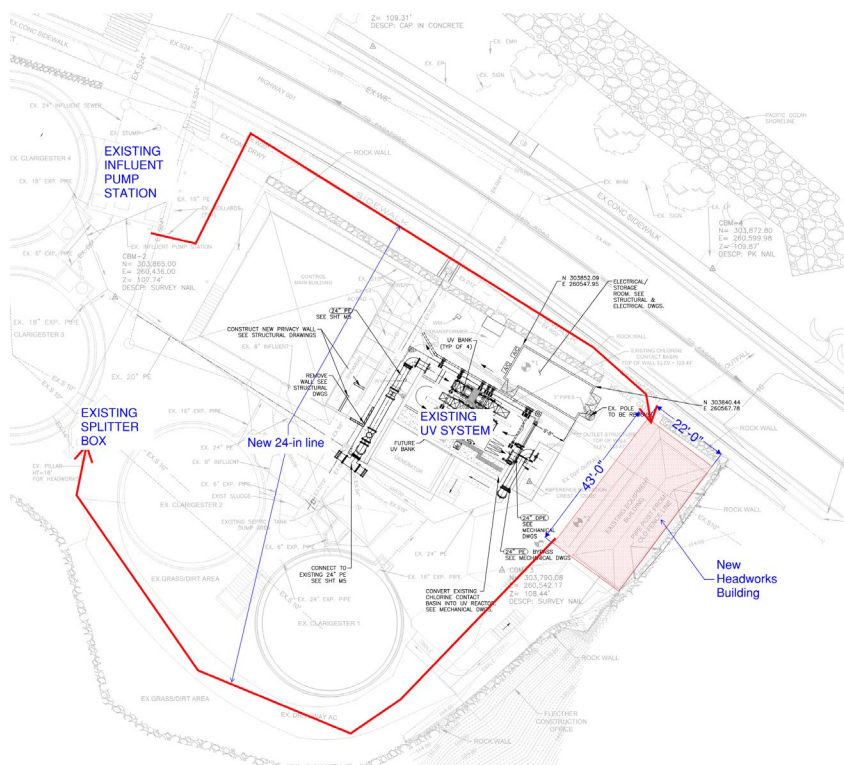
Utulei WWTP – New Headworks Building Layout
